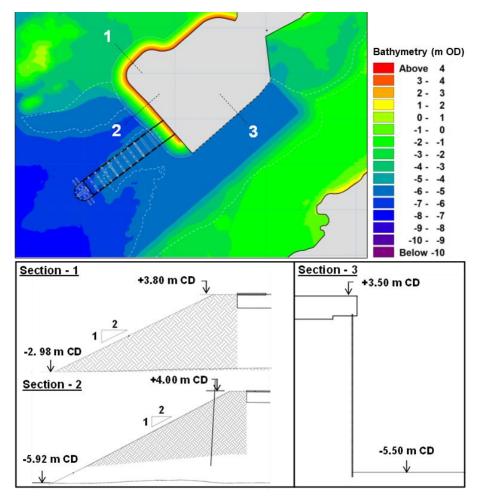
Cross-section locations and profiles for wave overtopping assessment
